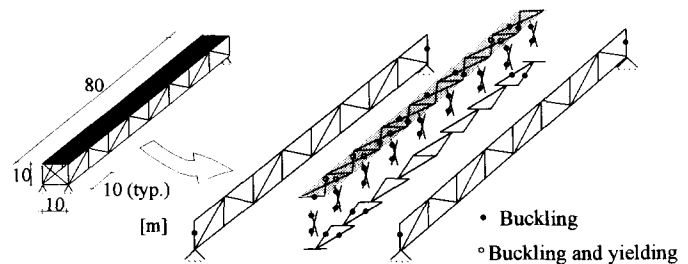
Damaged Members in Deck-Truss Bridge Subjected to 0.5g El Centro Earthquake
